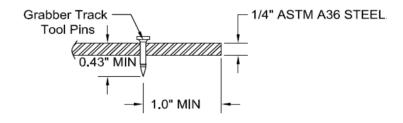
Grabber Track Tool Pin Locations in 1/4-inch Thick ASTM A36 Steel Plate
